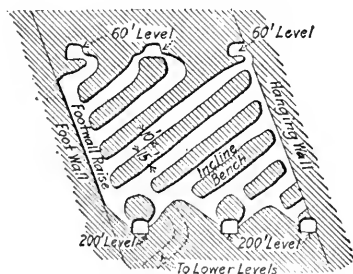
FULLY DEVELOPED CHAMBER READY FOR BREAKING OUT BENCHES, SECTION A-B OF FIG. 154.
